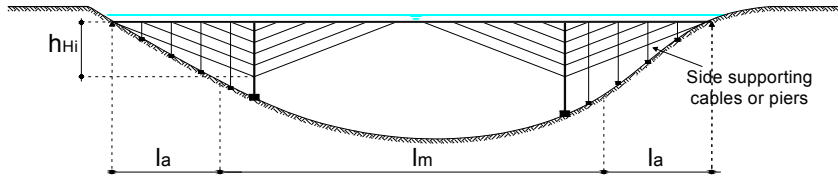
Three span symmetrical Immersed Inversed Harp Cable-stayed Bridge with side spans supported by additional cables or piers.
